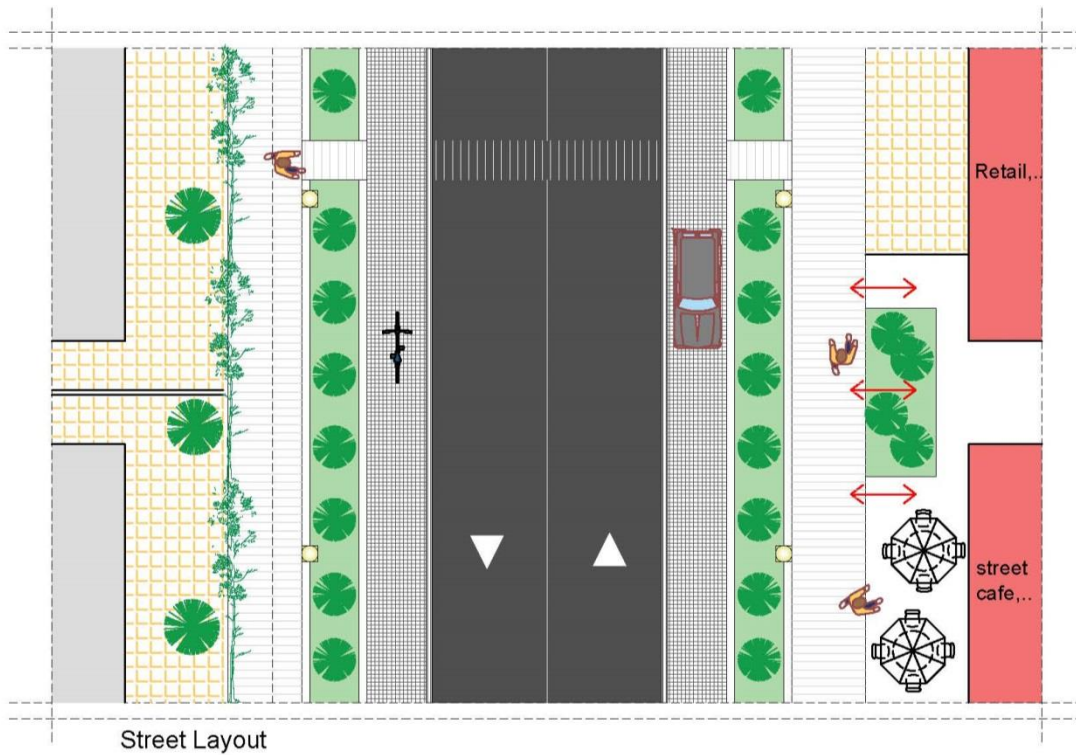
Street section and layout for the first stage proposal. (Source: Author)
